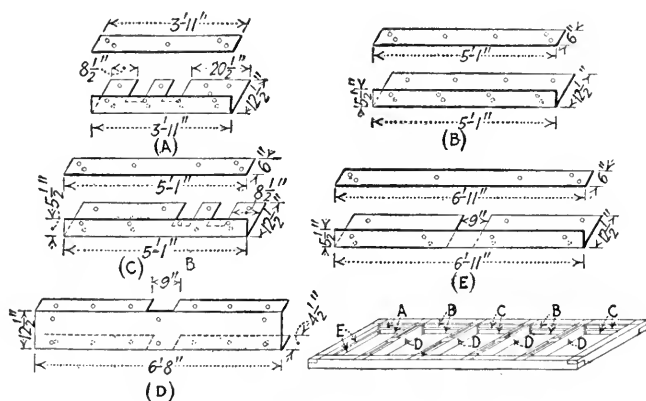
BLASTING IRONS USED IN HANCOCK SHAFT.
